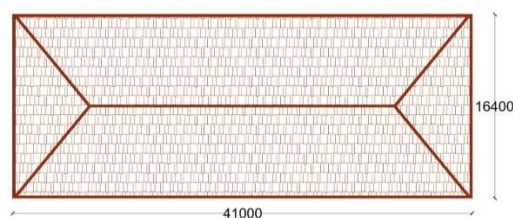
6 Layout of Shield Roof of Hamzah Dormitory (Building E)
